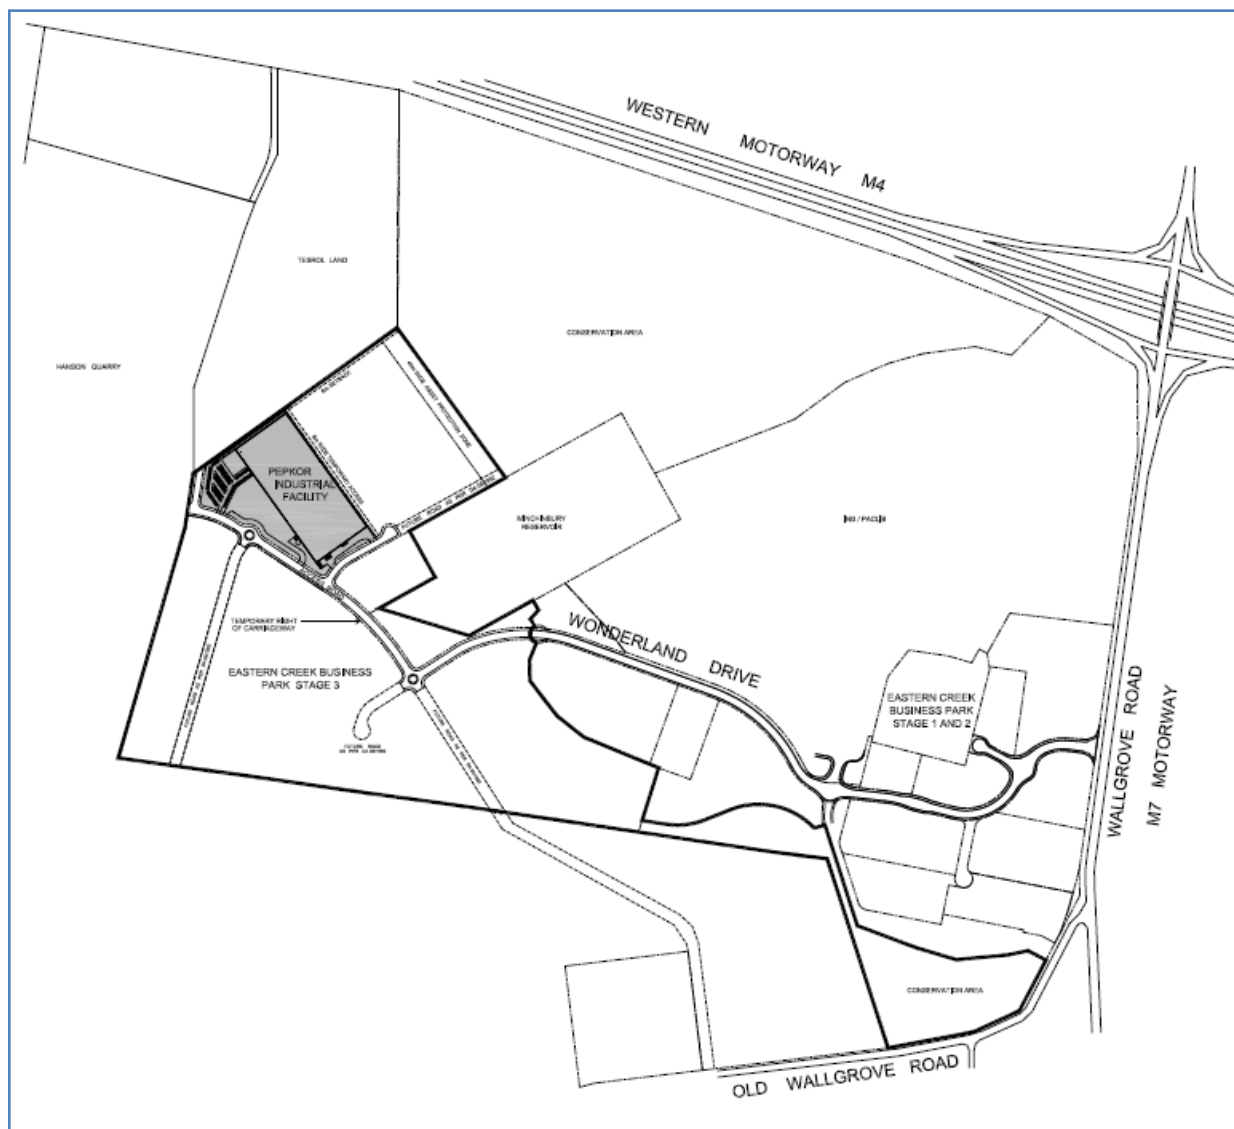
Location Plan (Source: Australand, Dwg. No. PK-EC3-DA-002[B], dated 5.11.09)
